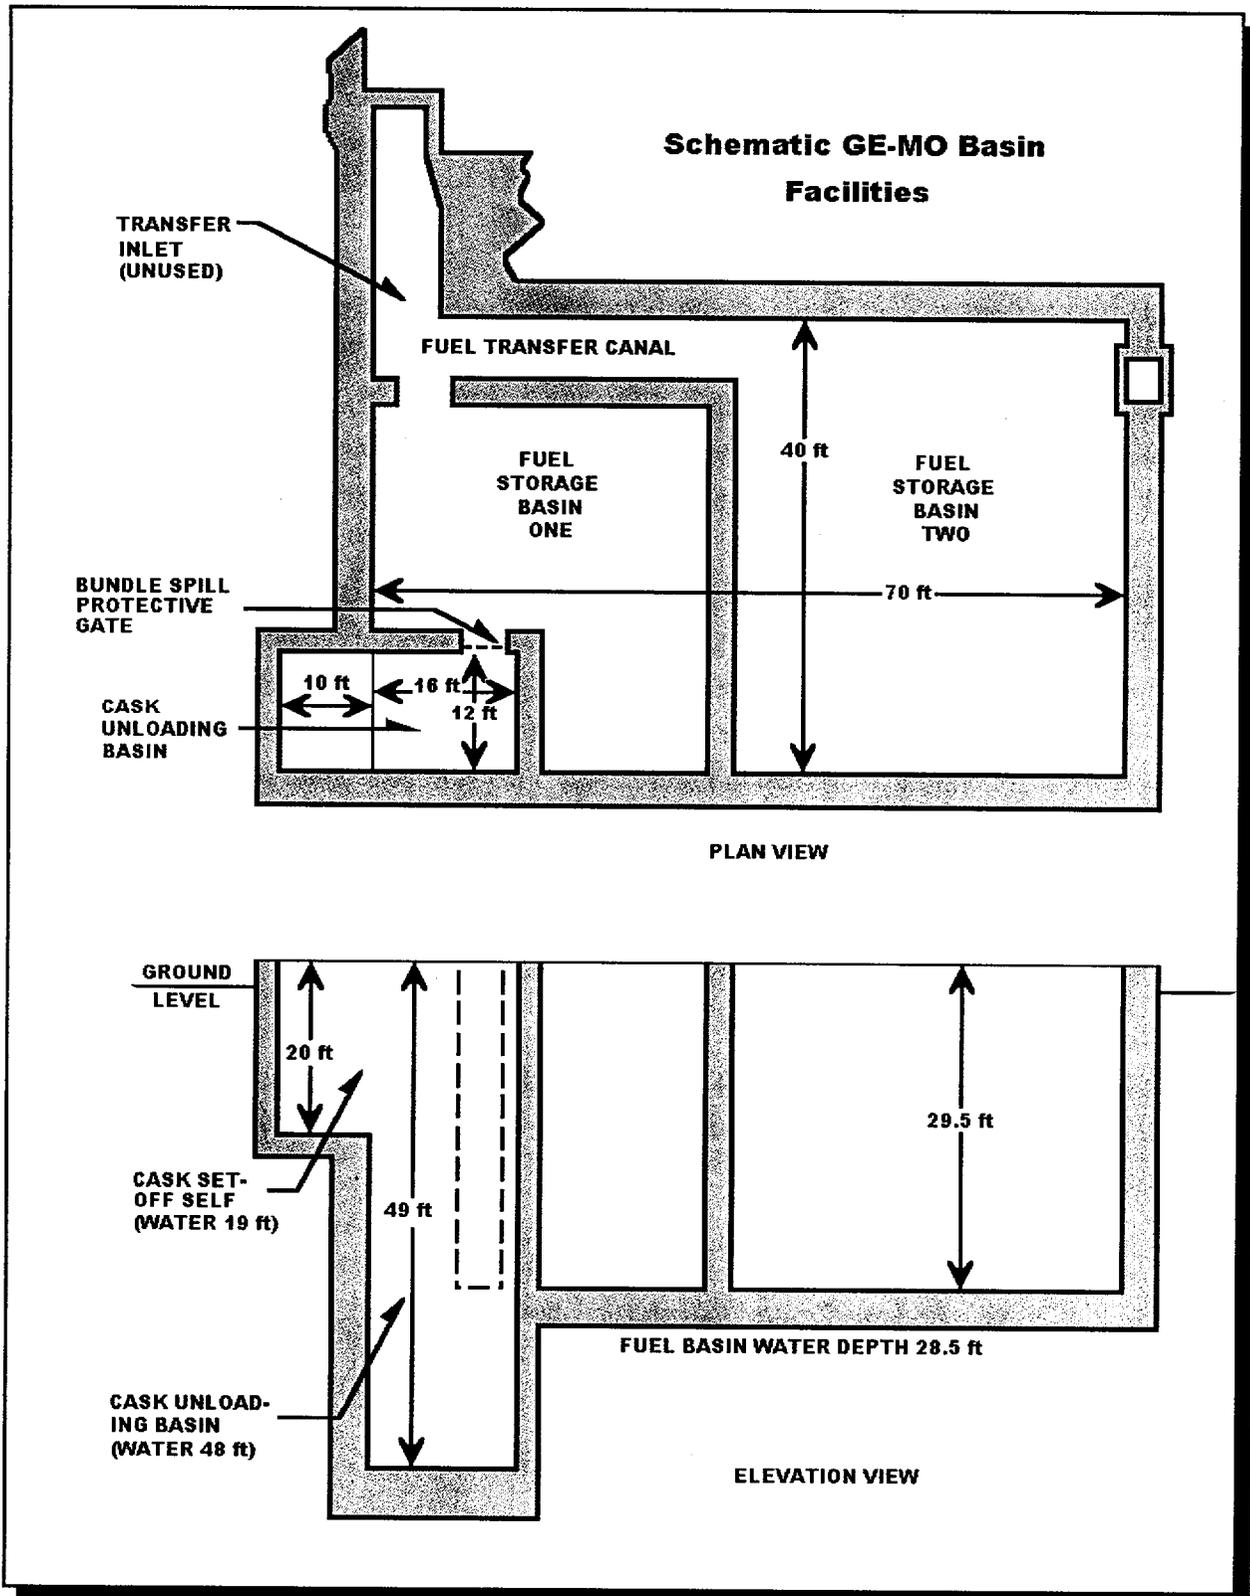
Pool (Wet) Storage Facility (Source: GE 2000)
